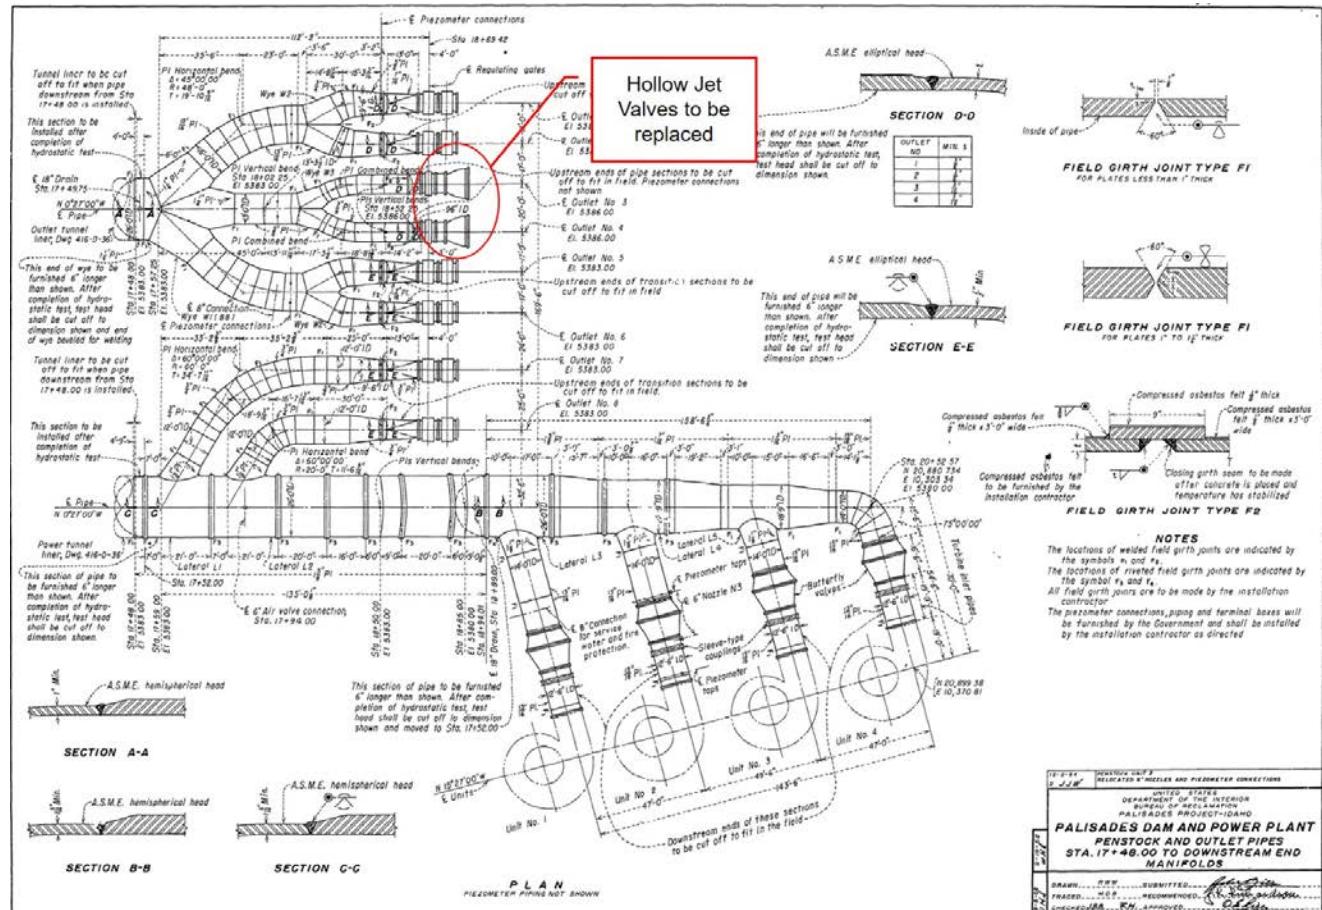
Drawing of penstocks and outlet pipes, identifying existing 96-inch hollow-jet valves to be replaced.
